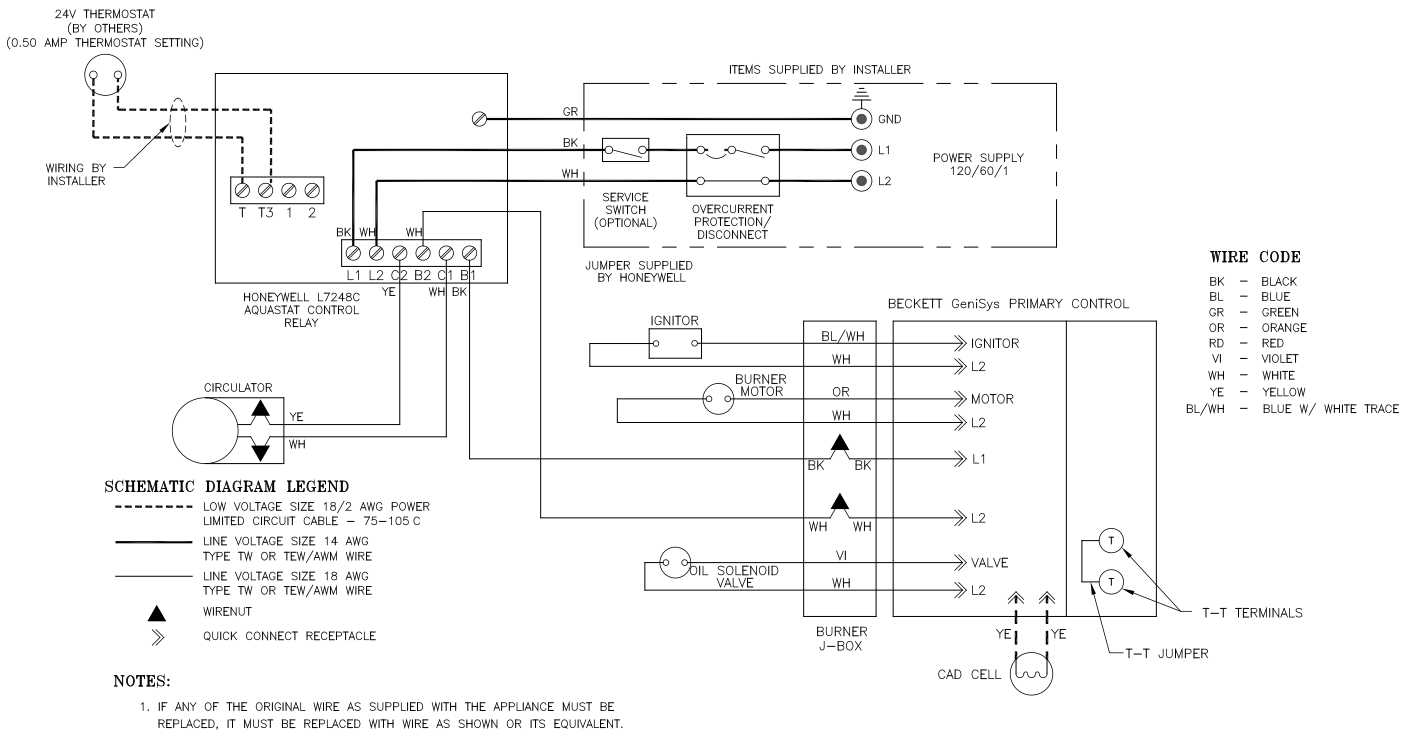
AP-U Boiler Wiring Less Tankless, Single Circulator w/Beckett Burner
